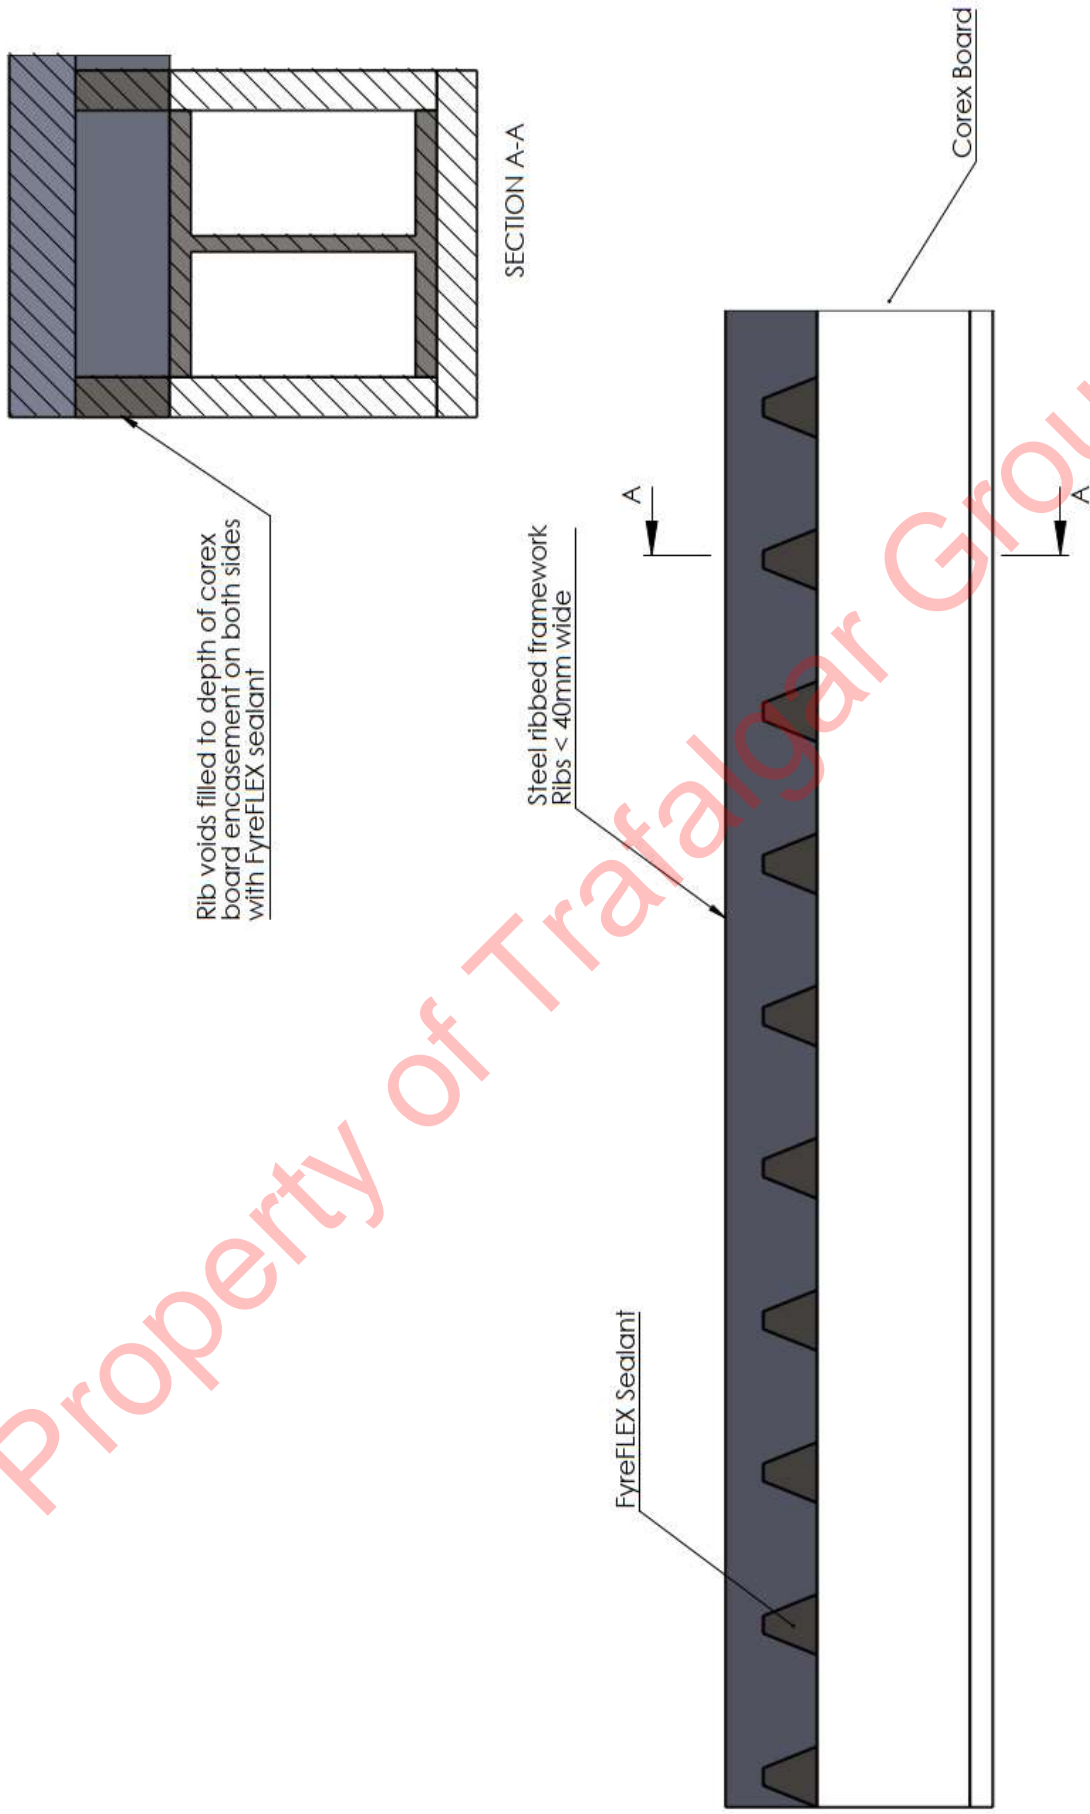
The construction detail of protected beam perpendicular to the voids of a composite floor slab with ribs (< 40 mm) filled with Trafalgar FyreFLEX sealant along the length of the beam
